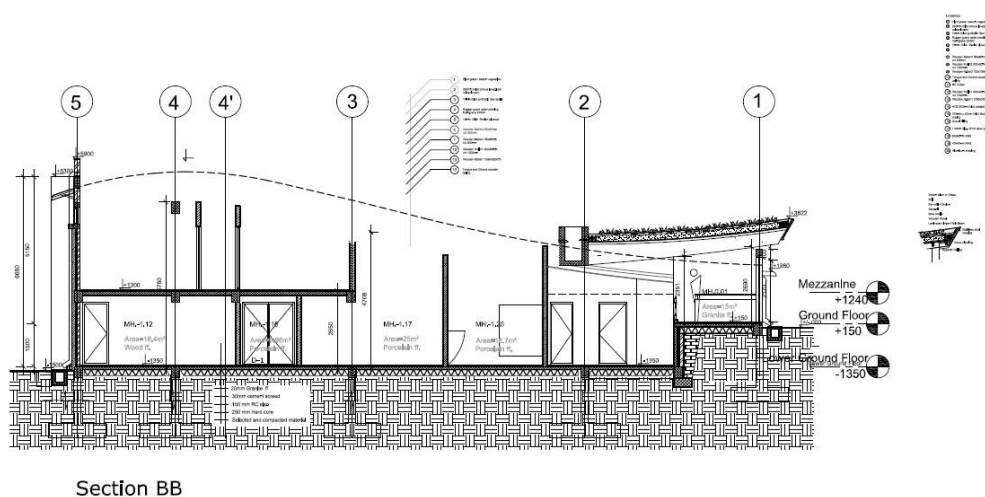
Section drawings, showing various construction details on the green roof of the Gulele HOAREC building. Source: ABBA architects plc
